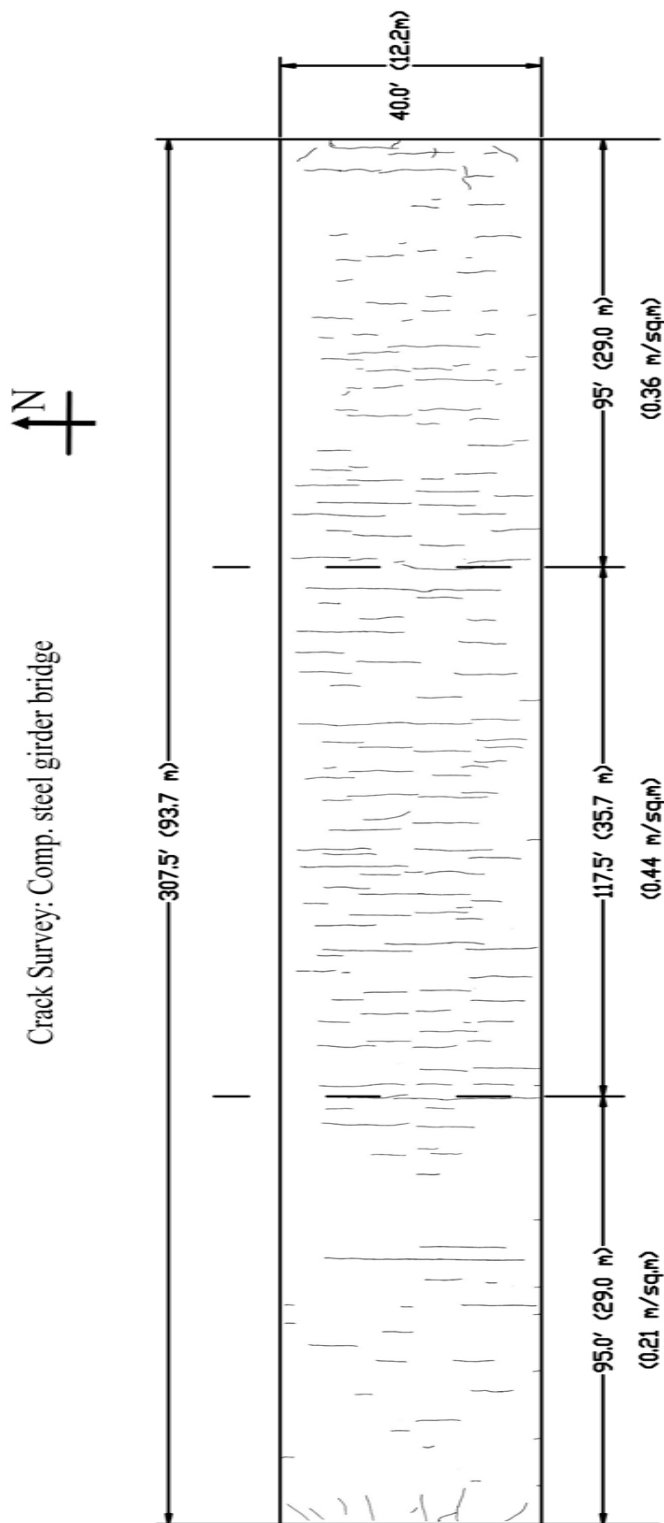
Steel Girder Bridge #50-178-199 Crack Survey
